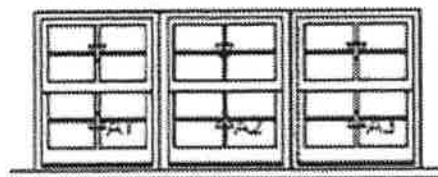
Proposed windows for the north elevation of the new addition (kitchen)
